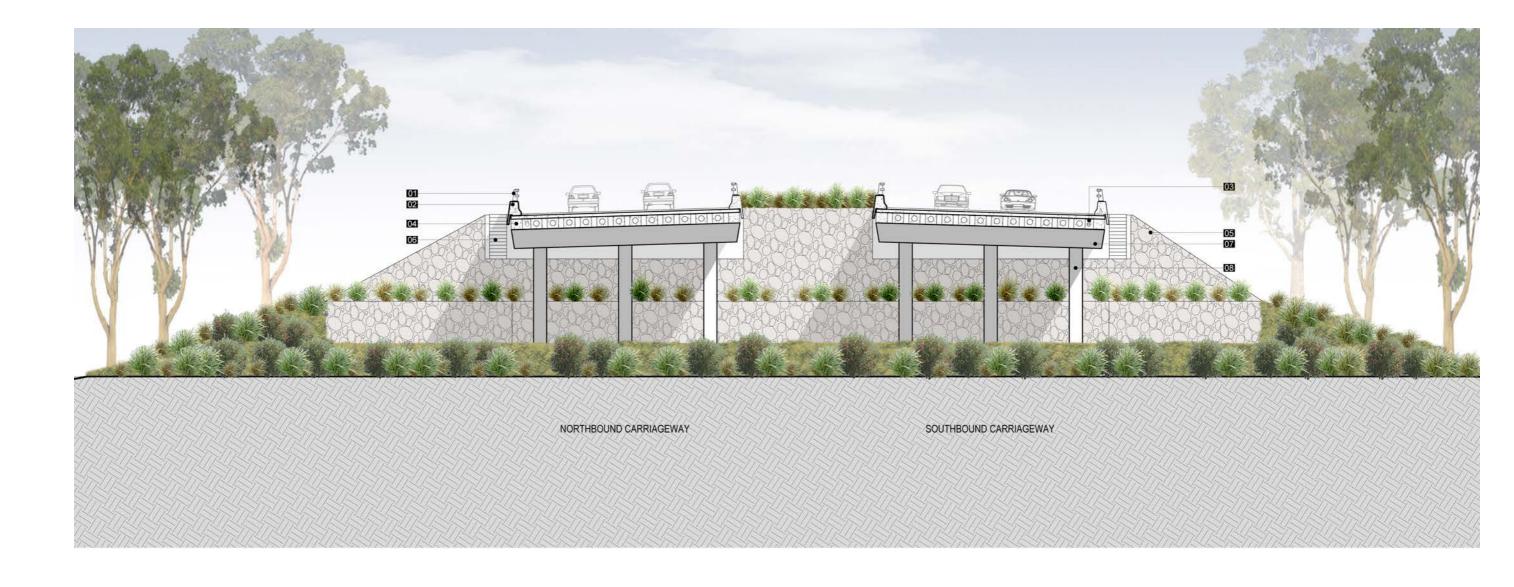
Twin bridges over Smiths Creek: Elevation
